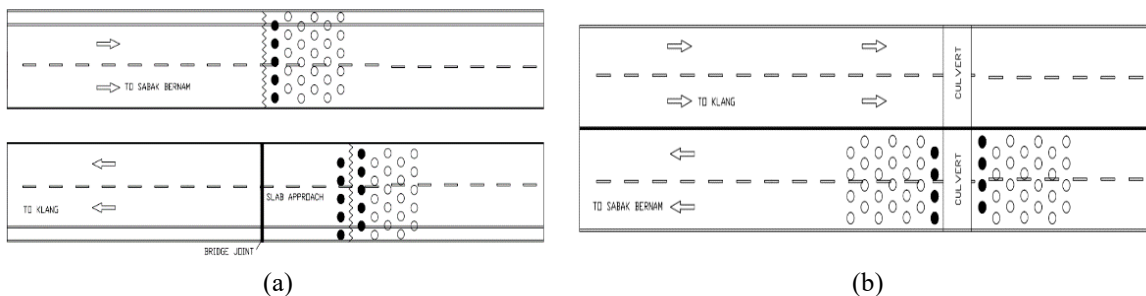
The area injected with PU foam at (a) Kuala Selangor Bridge (both direction of one of abutment); and (b) Culvert at Sg Gulang – Gulang (Route from Klang to Teluk Intan) (Zainuddin *et al.*, 2021).
